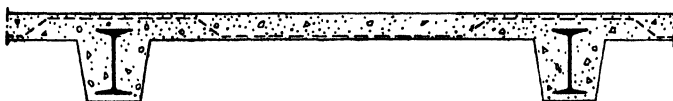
Steel Beams, Fireproofed, Supporting Concrete Slab.* (See p. 628.)
